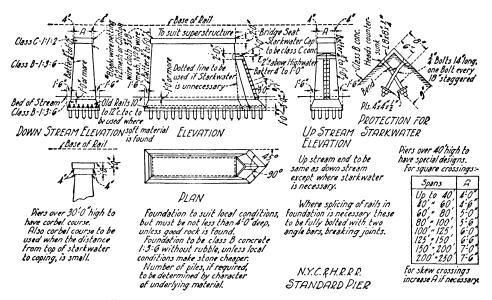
Masonry Piers, N. Y. C. & H. R. R. R.
